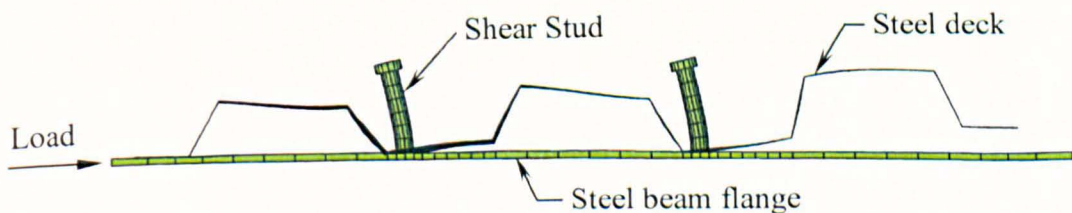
Typical deformations of the steel deck and the shear stud in push test with favourable positioned studs
